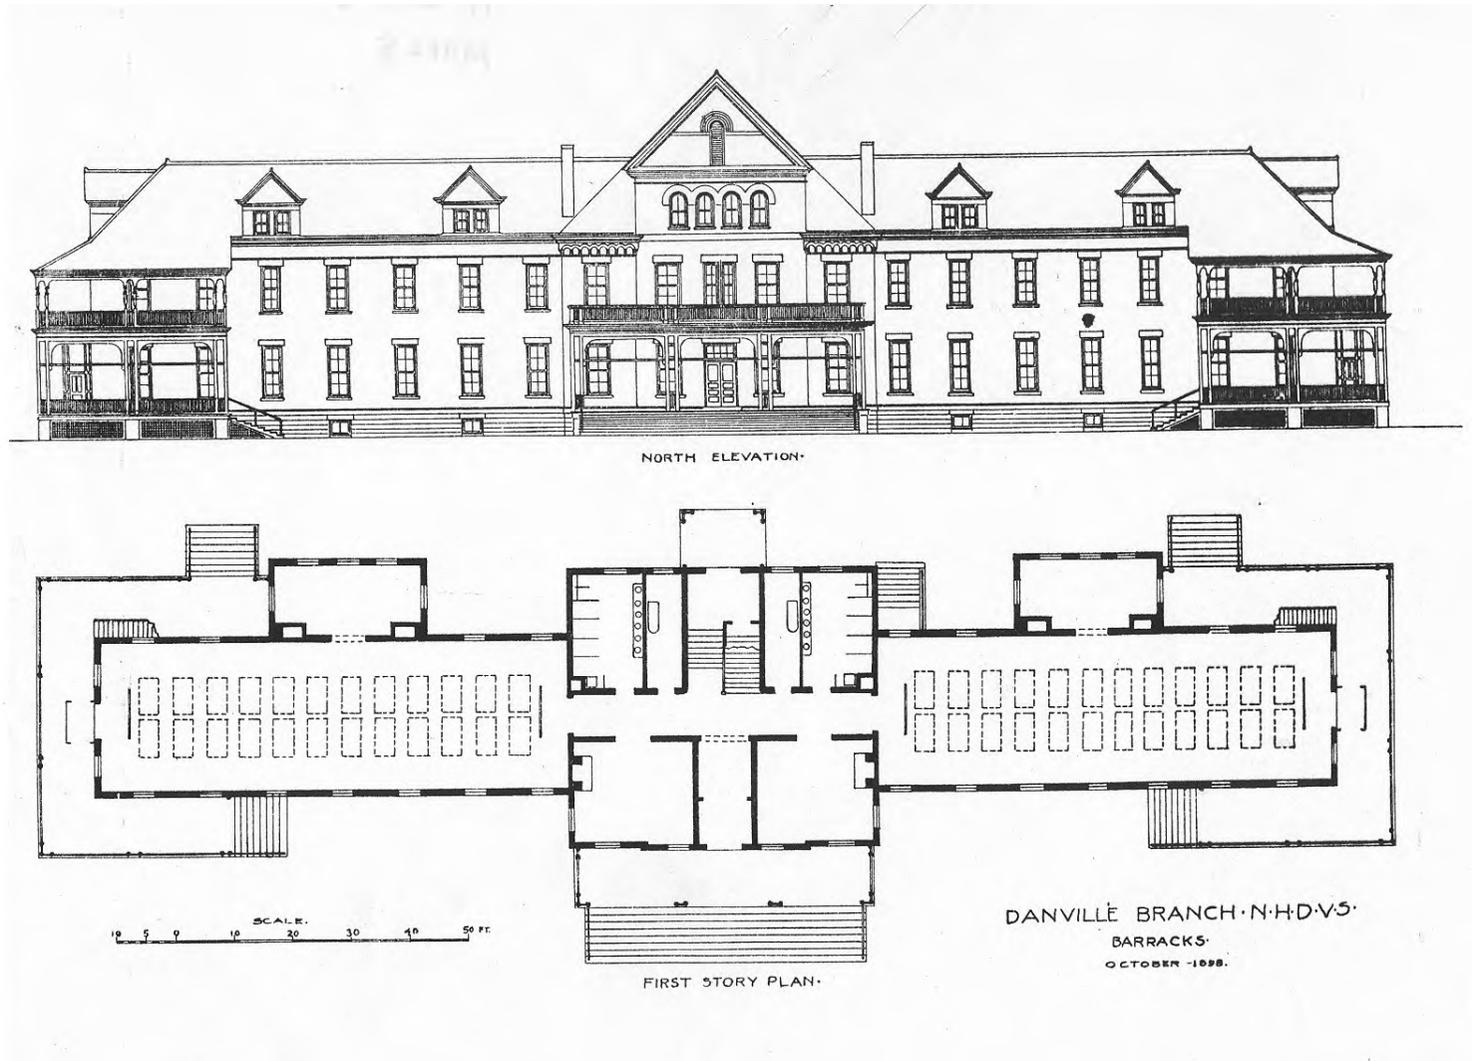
Representative plans of the north elevation and first floor of the type of barracks constructed at the Danville Branch, NHDVS. These plans reflect the original design of Building 10 (House Doc. 55, plate 8).
